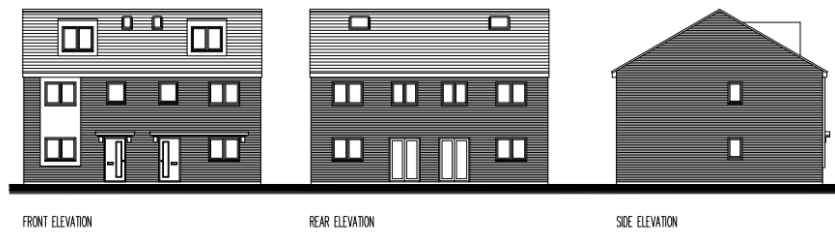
Example of house type B80/B79 - frontage on Yardley Wood Road along plots 13, 14 and 15
